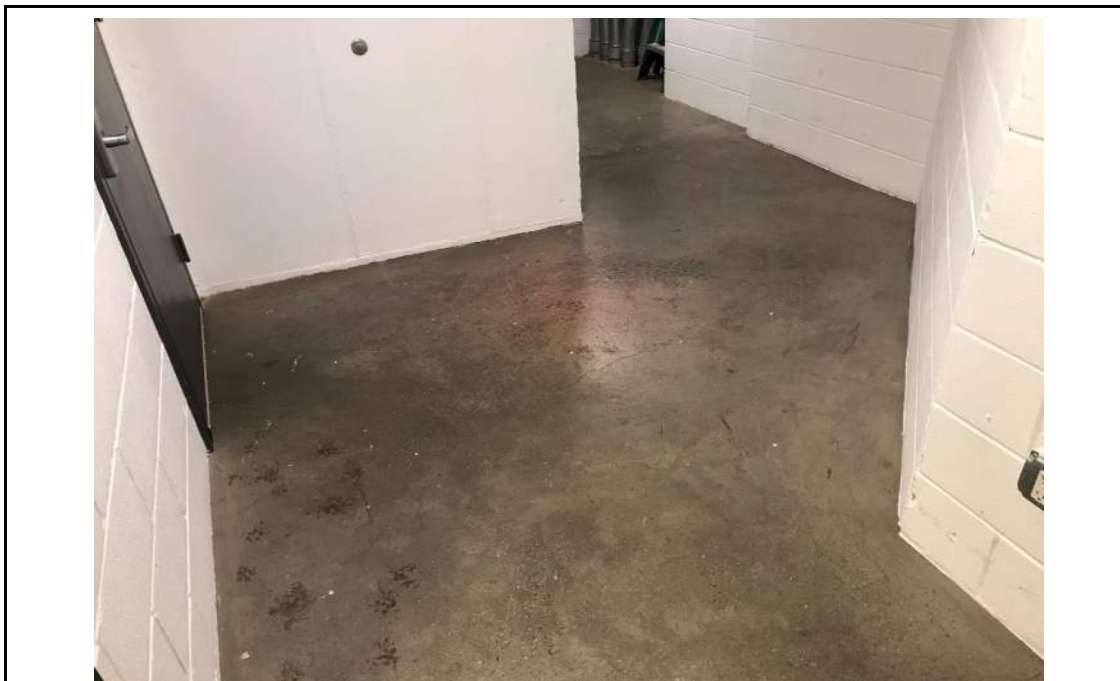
First floor concrete slab in southeastern portion of the building, facing north. 6 February 2020.
